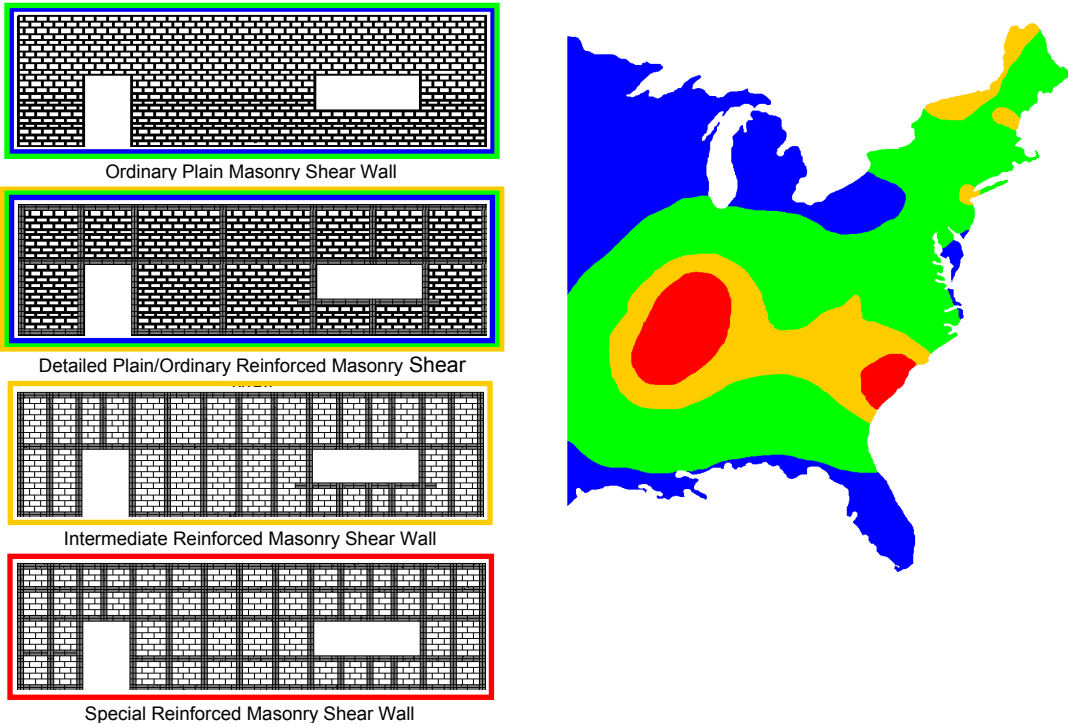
(a) Schematic of the IBC reinforced masonry shear walls and (b) SDC of the Eastern US for soil condition C (IBC 2003 [6]).
